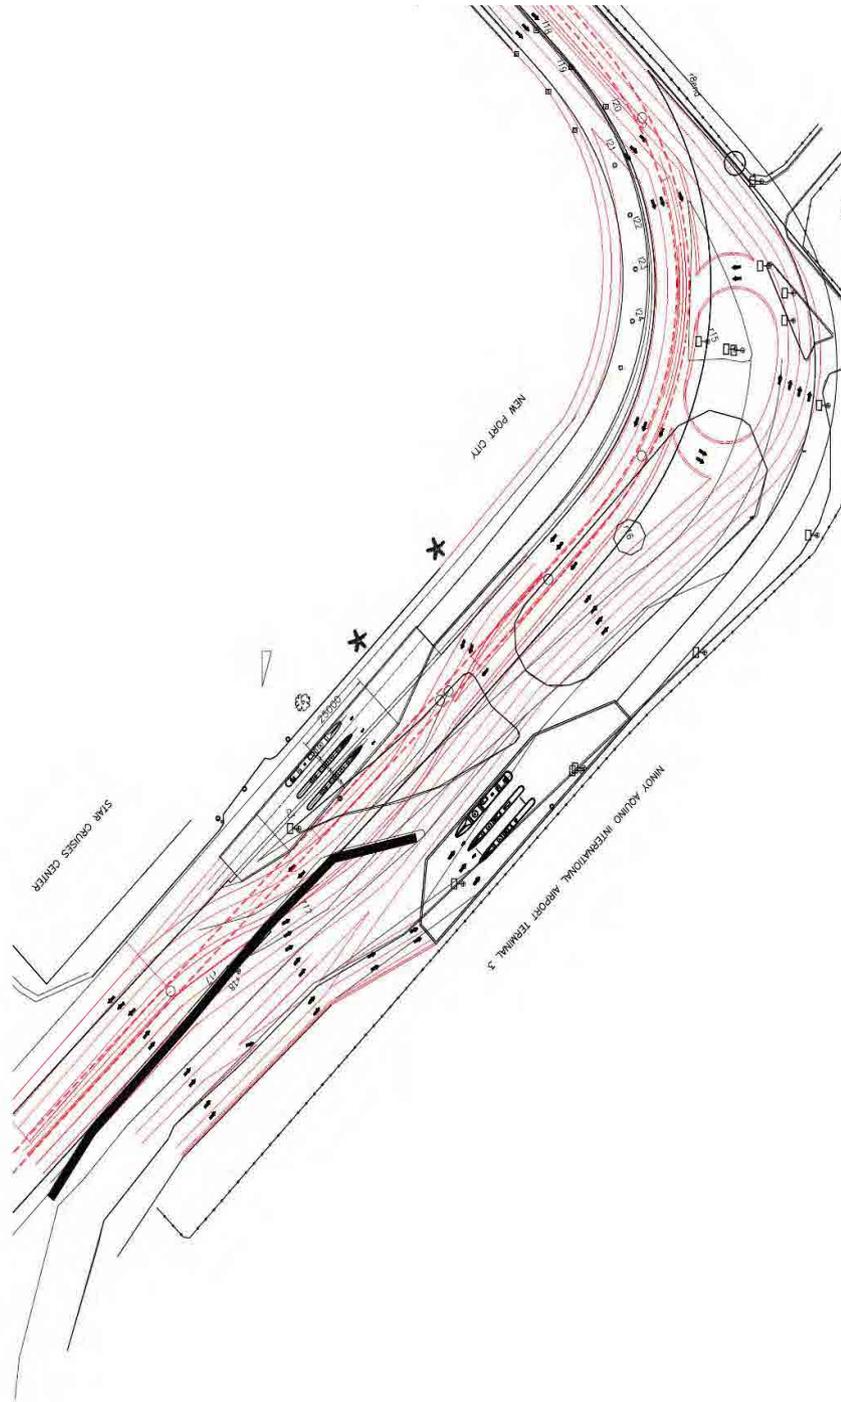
AT-GRADE ROAD PLAN (ANDREWS AVENUE)
